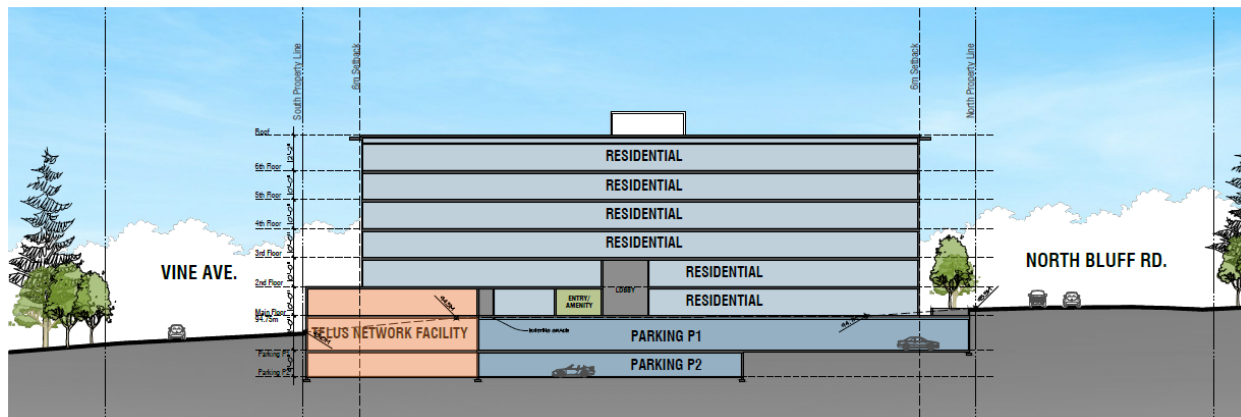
Sectional Elevation (north-south) of the proposed development at 14780 North Bluff Road
